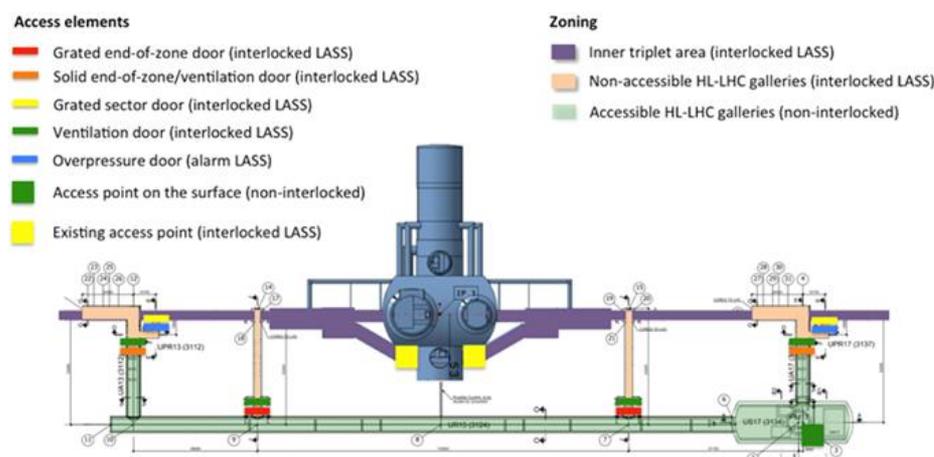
Underground access zoning and access elements at Point 1. Zoning of Point 5 will be similar as applicable with the exception of existing access point and service tunnel locations.
